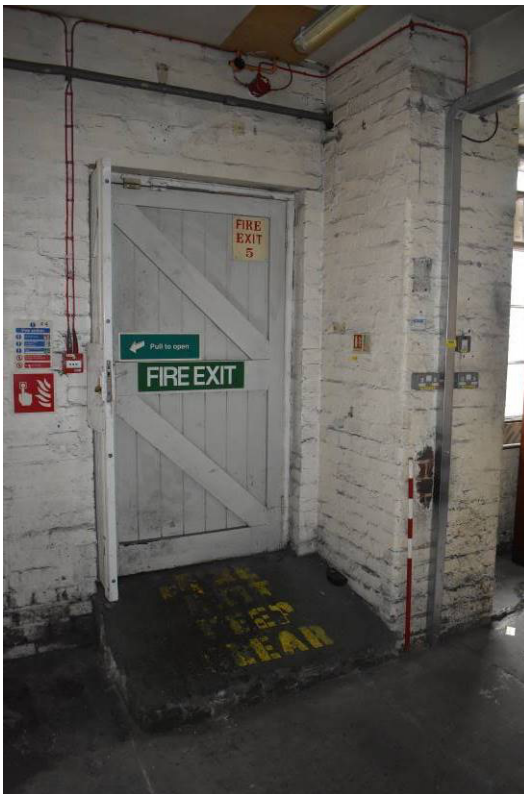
Door inserted in former window at [G12] with projecting former flue (see plan at §.3.3.4)
